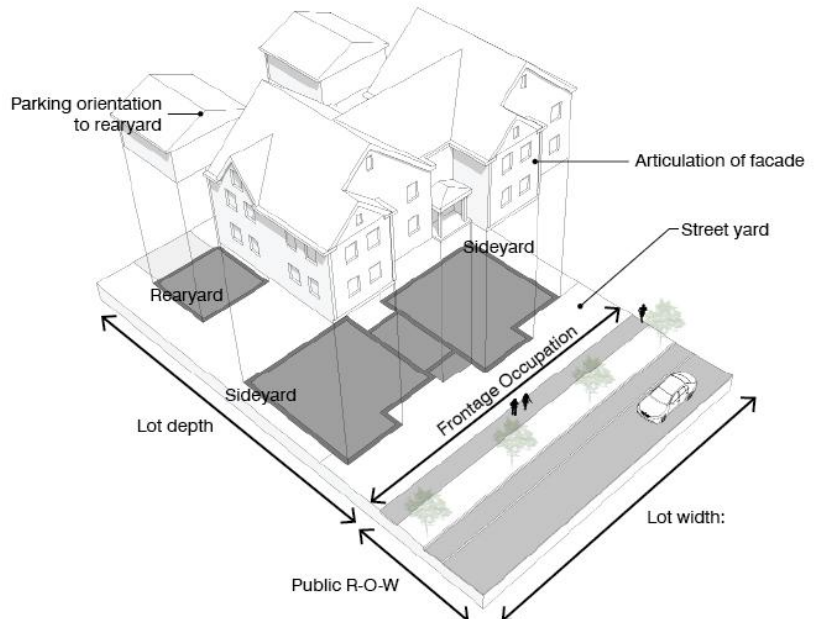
BUILDING AND SITE TYPES
